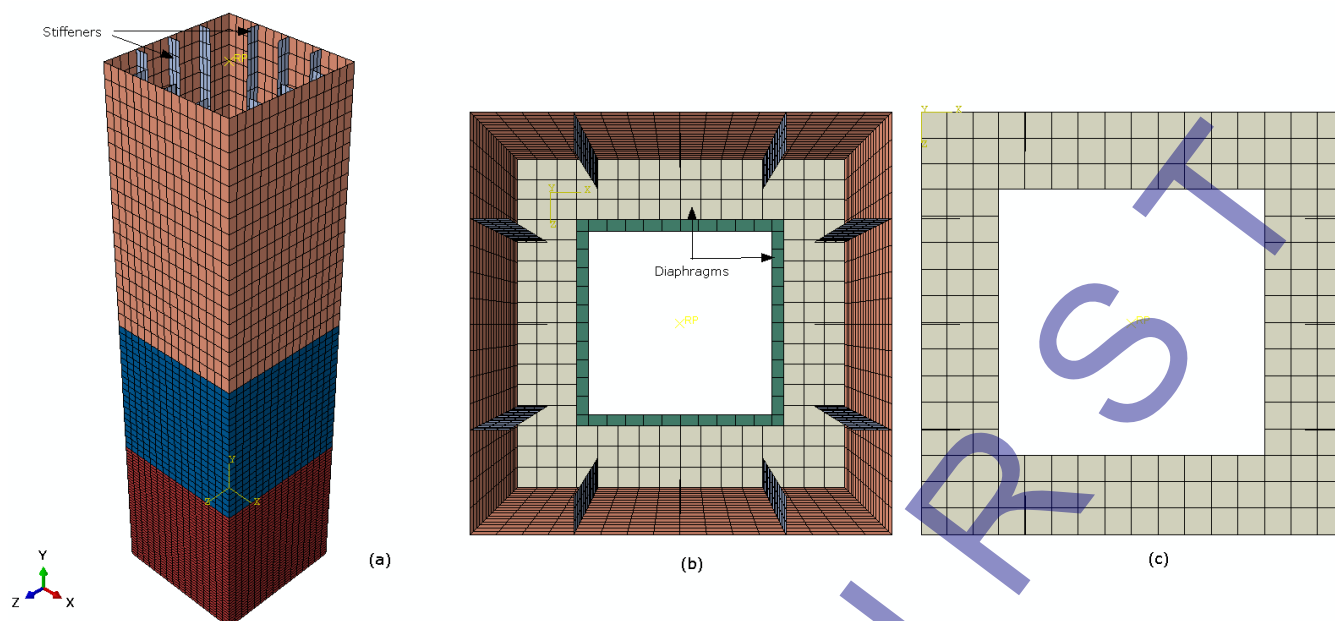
Column configuration: (a) FE Geometry, (b) Cross-section, (c) Diaphragm Section
